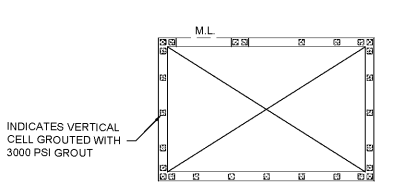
DETAIL OF ADDITIONAL VERTICAL REINFORCEMENT AT MASONRY WALLS 6
